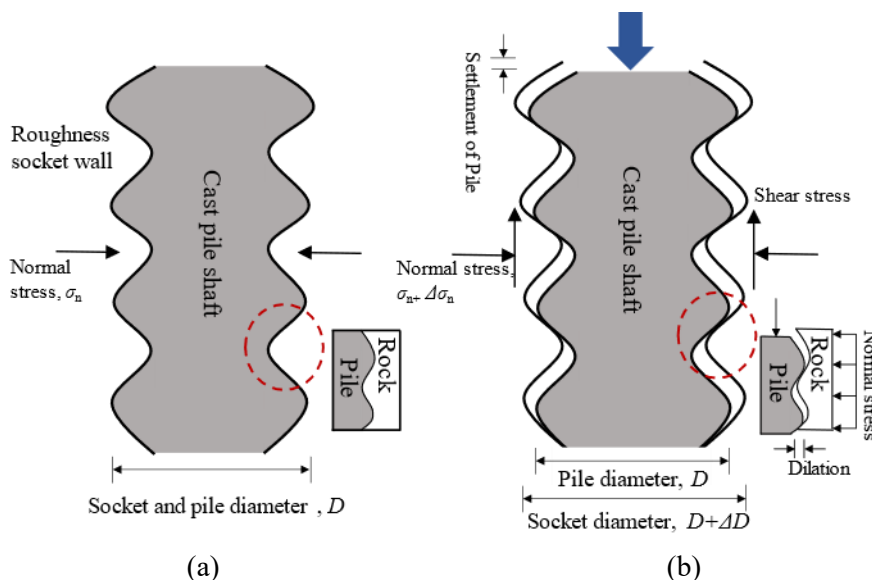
Bored pile socket into rocks: (a) initial rock-pile interface after casting; (b) pile settlement after axial loading
